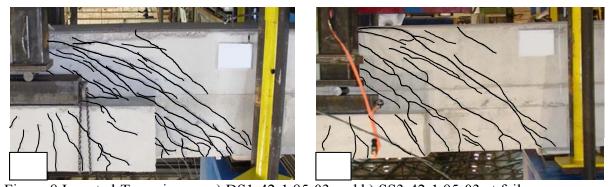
Inverted-T specimens: a) DS1-42-1.85-03 and b) SS3-42-1.85-03 at failure
